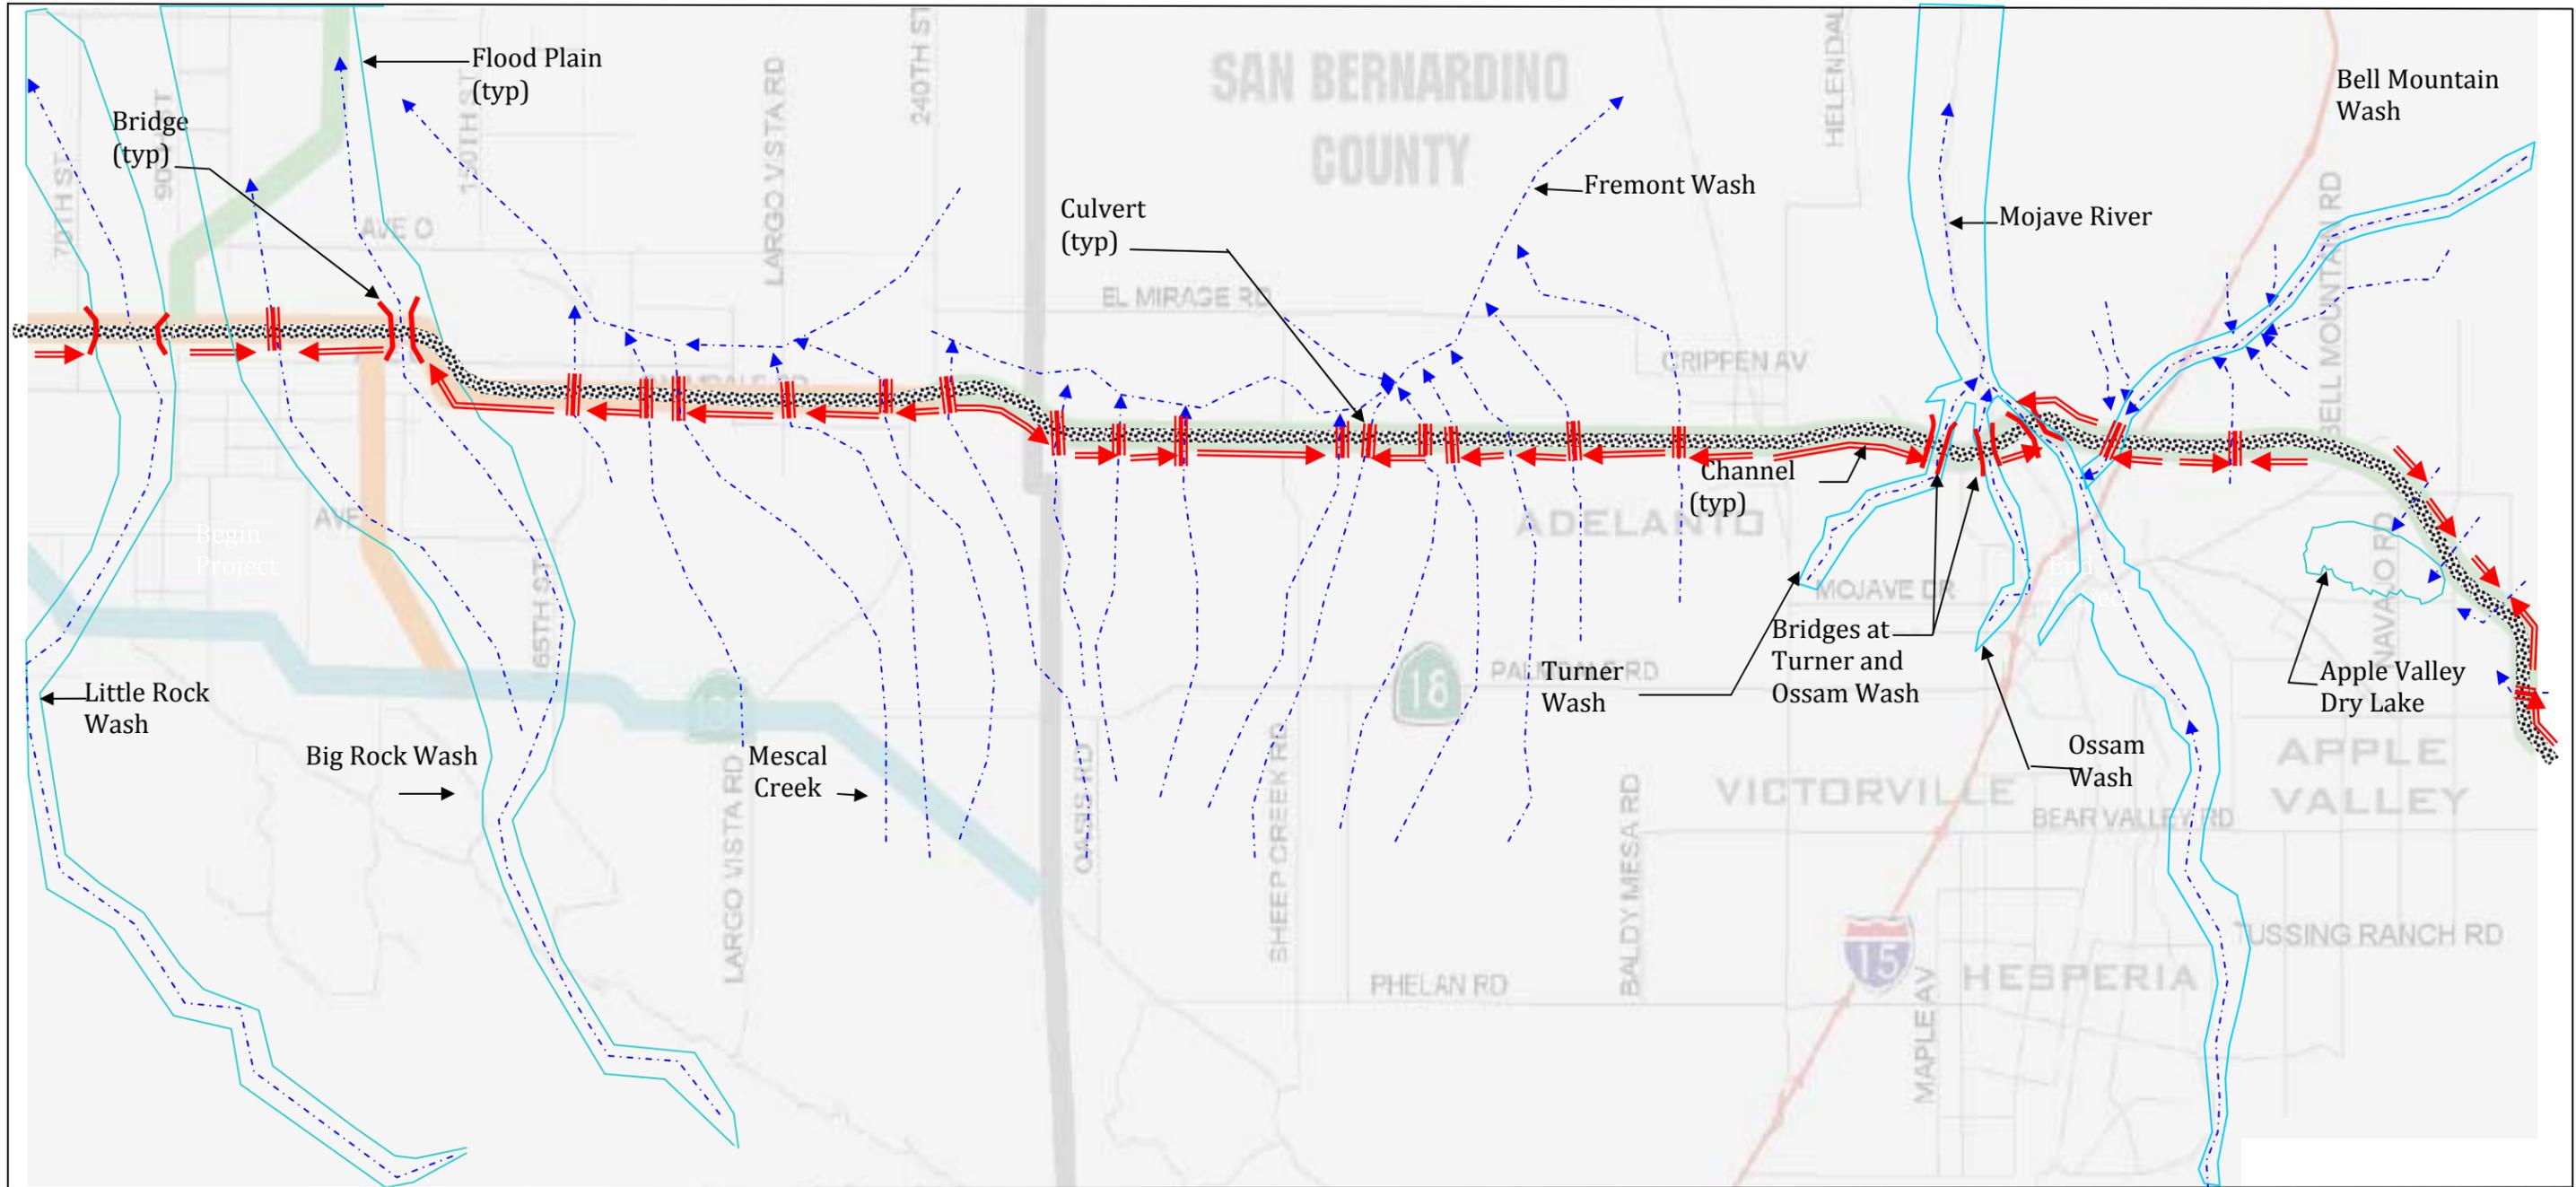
High Desert Corridor Proposed Offsite Drainage System Schematic
